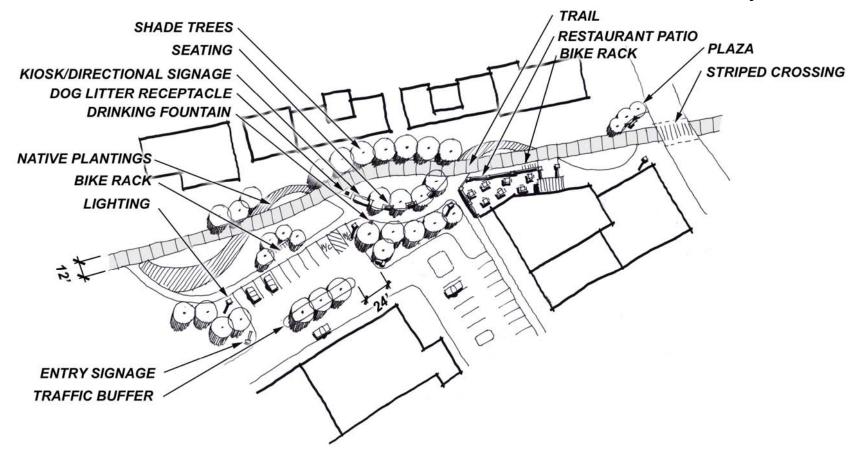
Typical Trail Head – Option 2, Built Urban Environment N.T.S. Plan View
